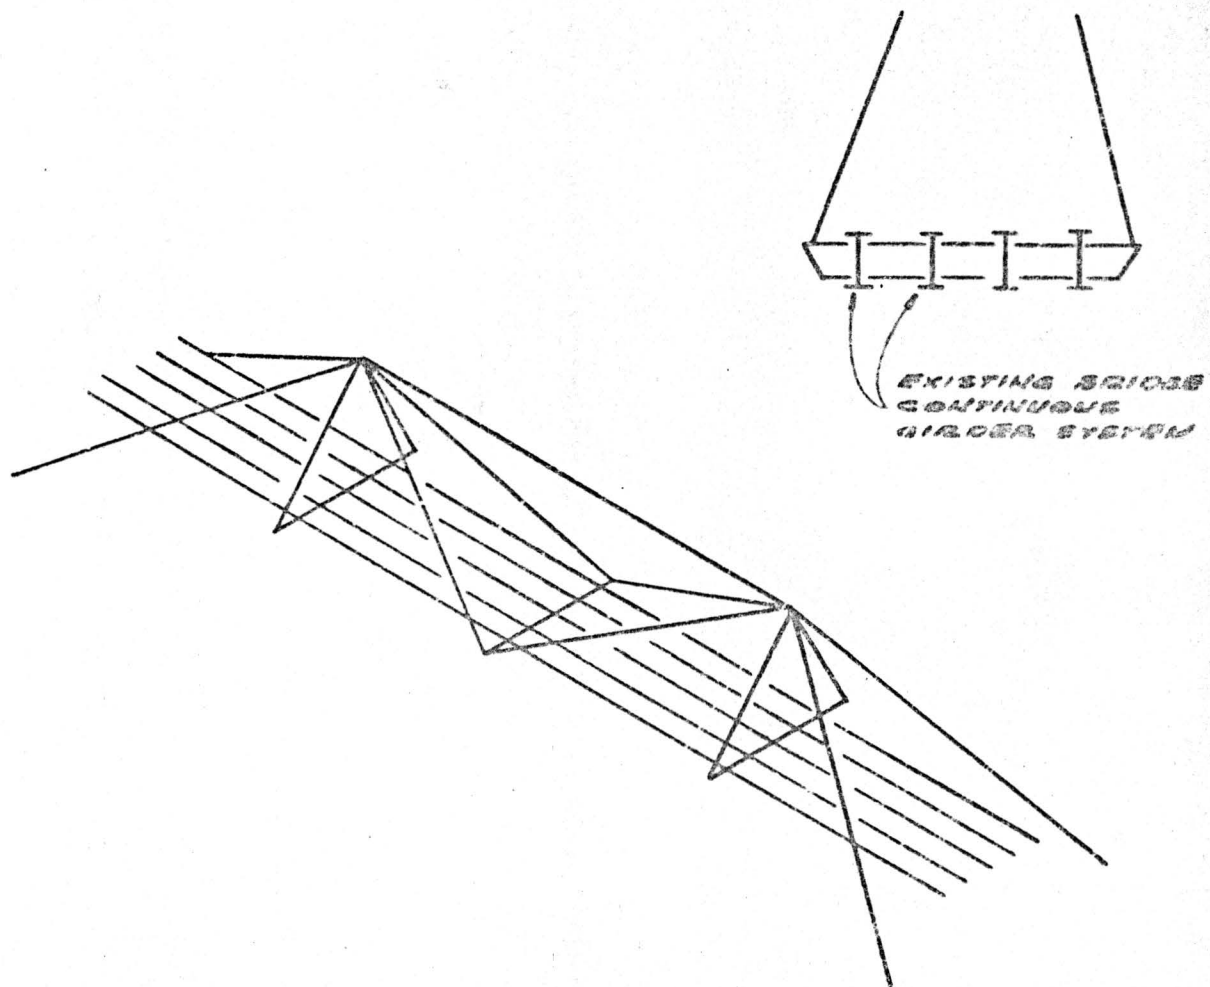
LEANING ARCHES BRIDGE CONCEPT APPLIED TO EXISTING BRIDGE
